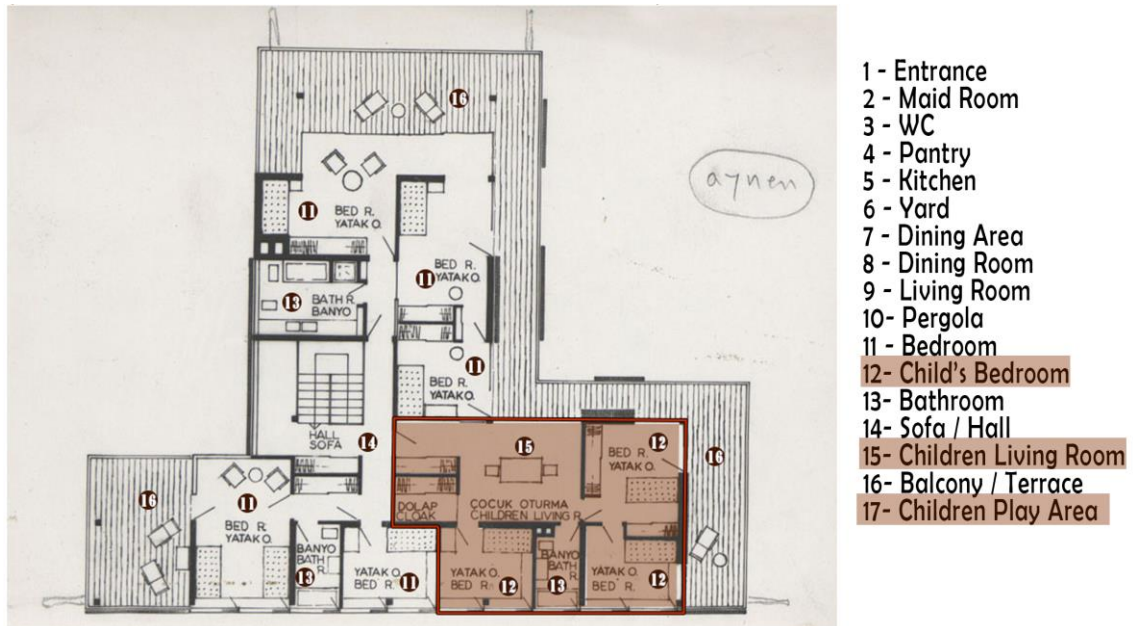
The first floor plan of Rıza Derviş House, İstanbul (Source: Edhem Eldem Collection, The image is accessible on SALT Research)
